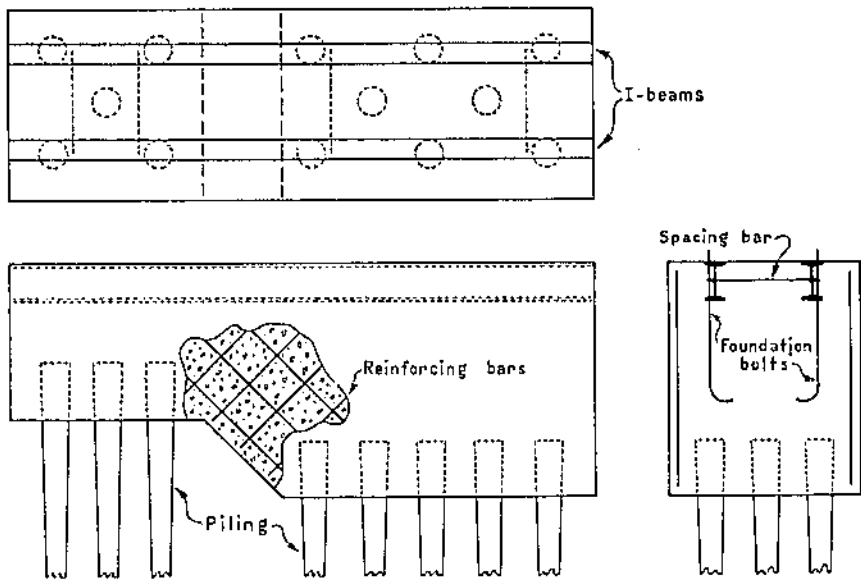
Suggested reinforced concrete foundation for direct-connected pumping unit.
